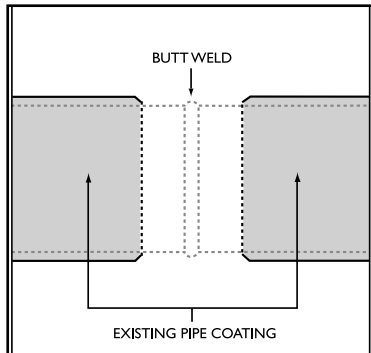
Butt weld and existing coating ready for overwrapping with tape. Note cutback of coating can be 75mm - 150mm either side of the weld except on FBE coated pipe.
